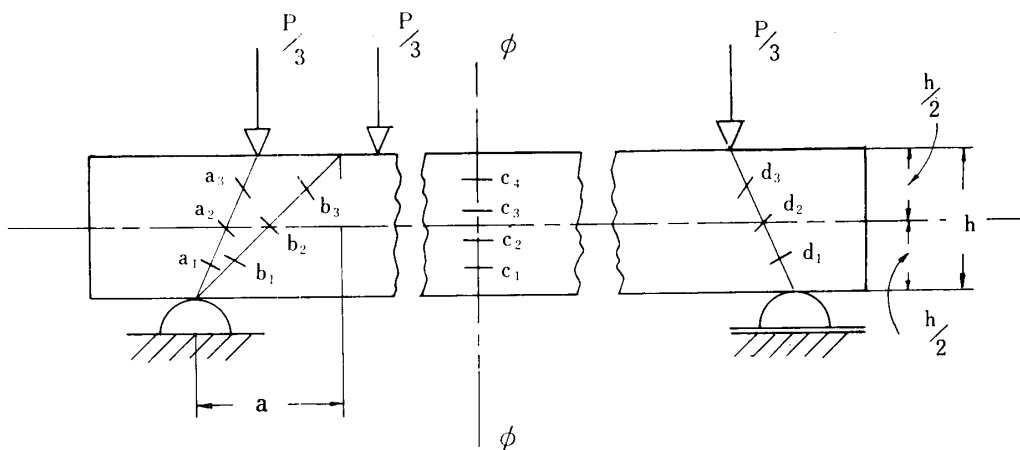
Positions of pasted paper gauges for measured strain of reinforced concrete beam
